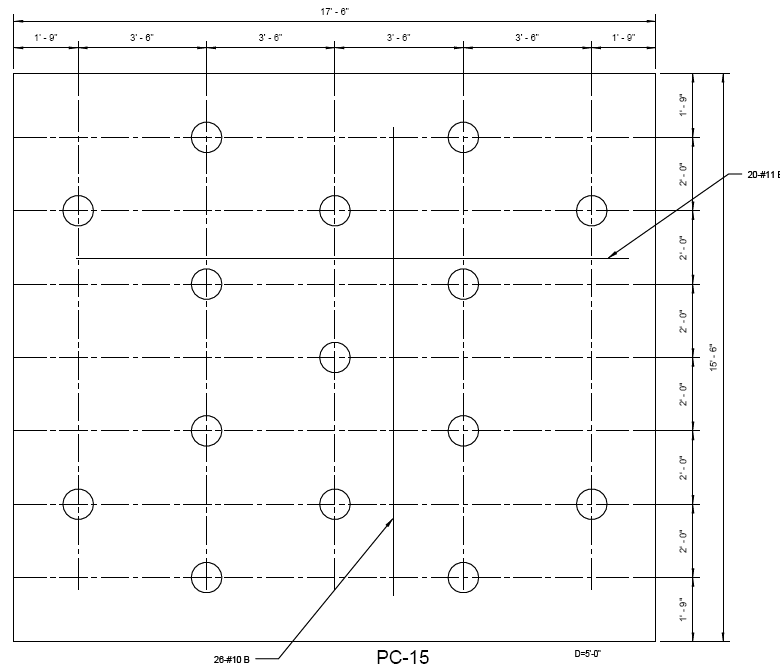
THIS IS PLAN OF A SAMPLE PILE CAP. DETAIL COURTESY OF TURNER CONSTRUCTION.
